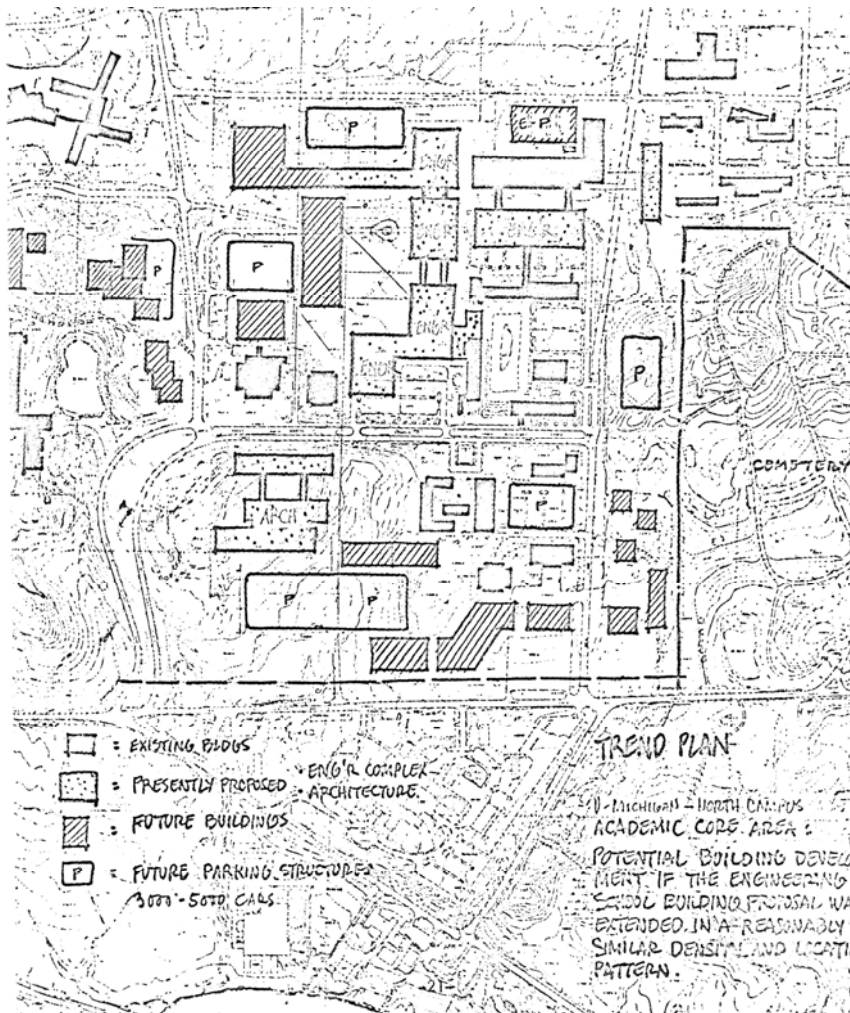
Building Plan from the 1971 North Campus Land Analysis
